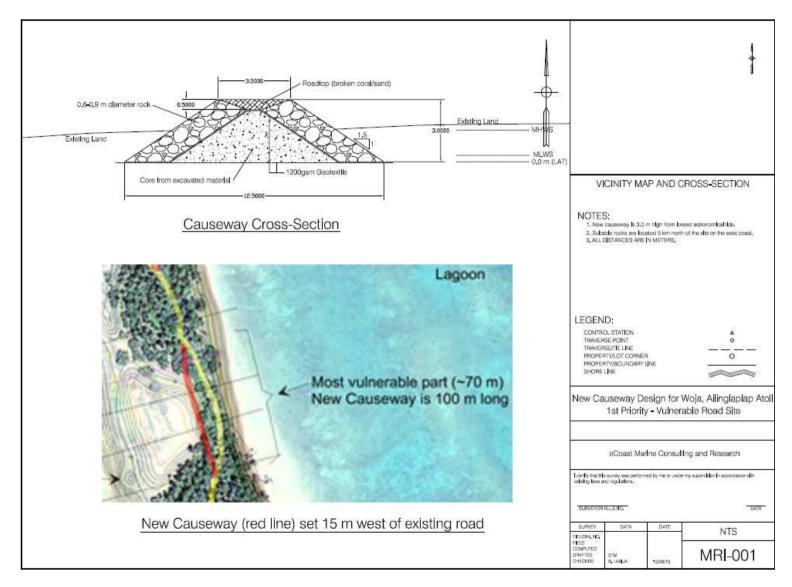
Location and cross-section for Priority 1 southern causeway road.
